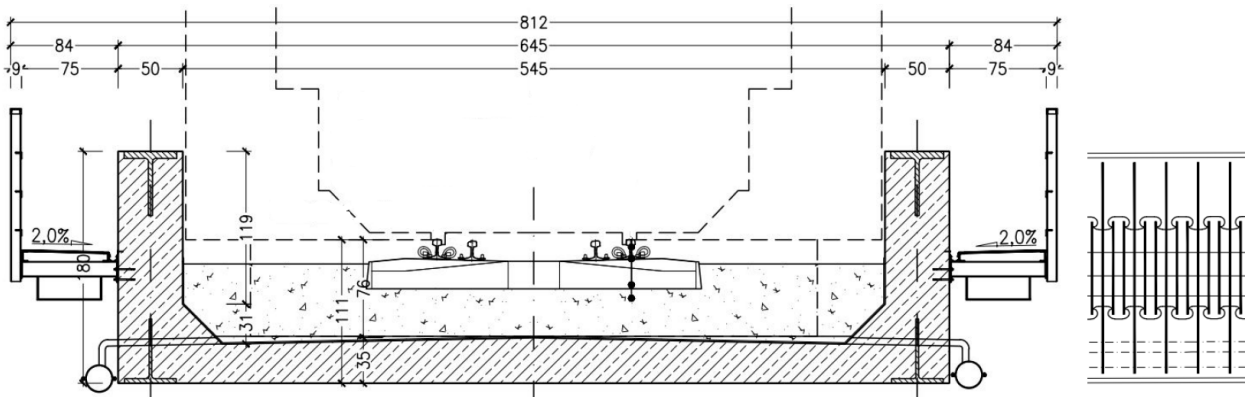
Cross section of the Dąbrowa Górnicza bridge and, on the right, longitudinal section showing the T-sections and rebar arrangement in the girder's web.
